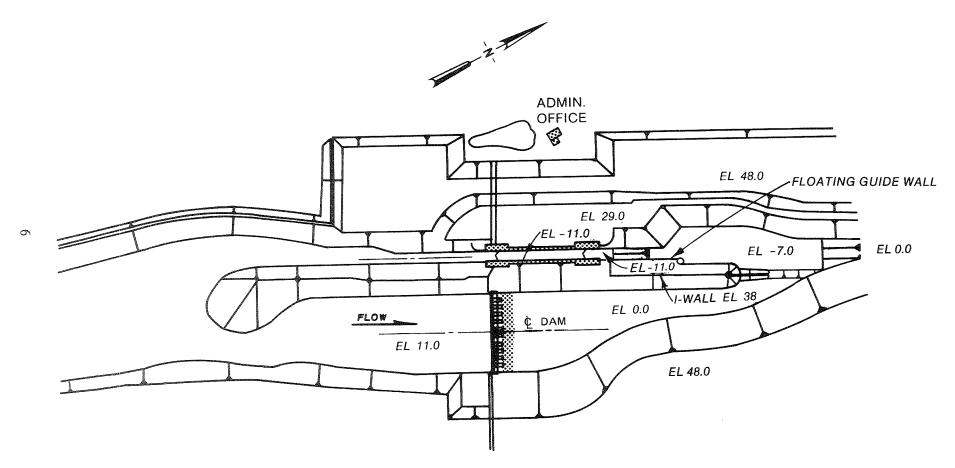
Red River Waterway Lock and Dam No. 1, as constructed
